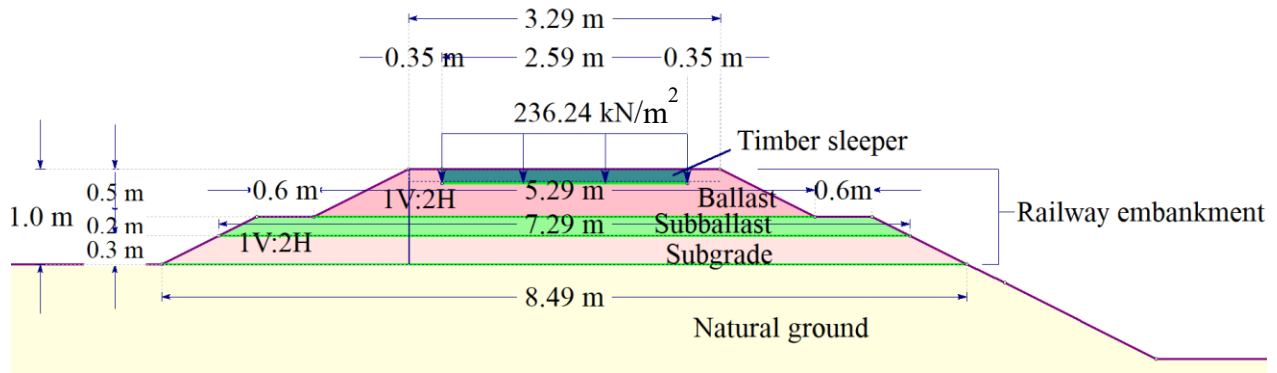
3. Cross-section of the railway embankment structure with dimensions.
